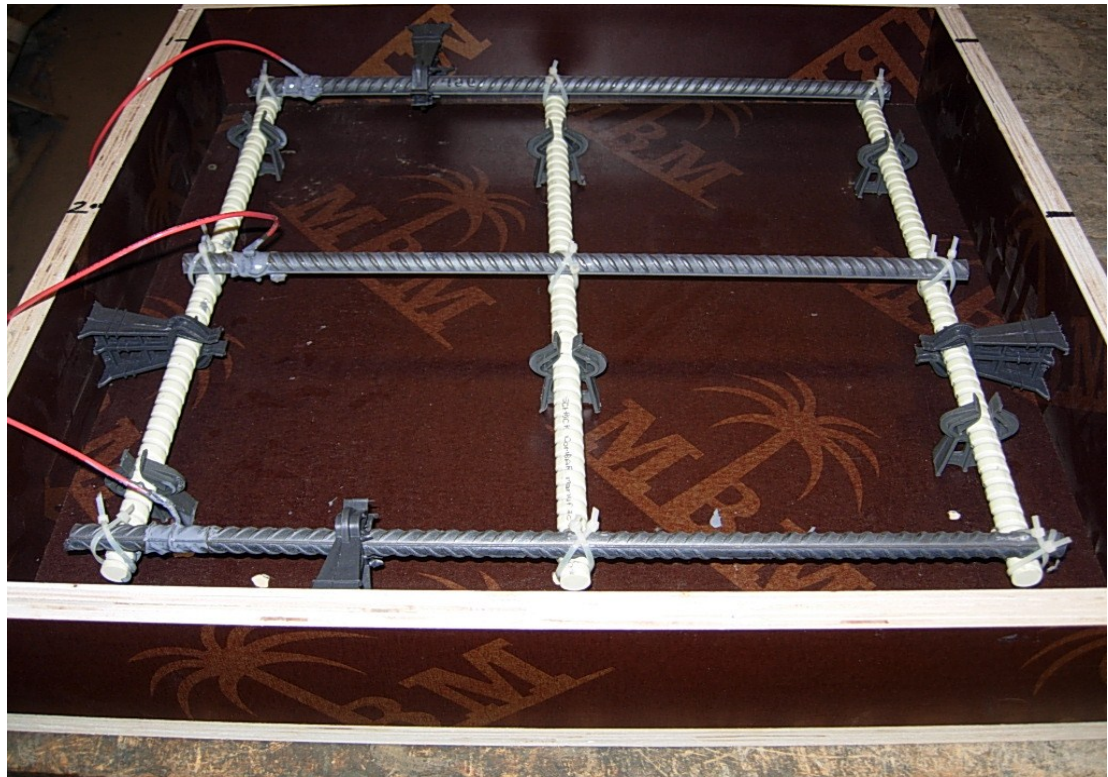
Photograph showing reinforcement details in concrete slab specimens.
